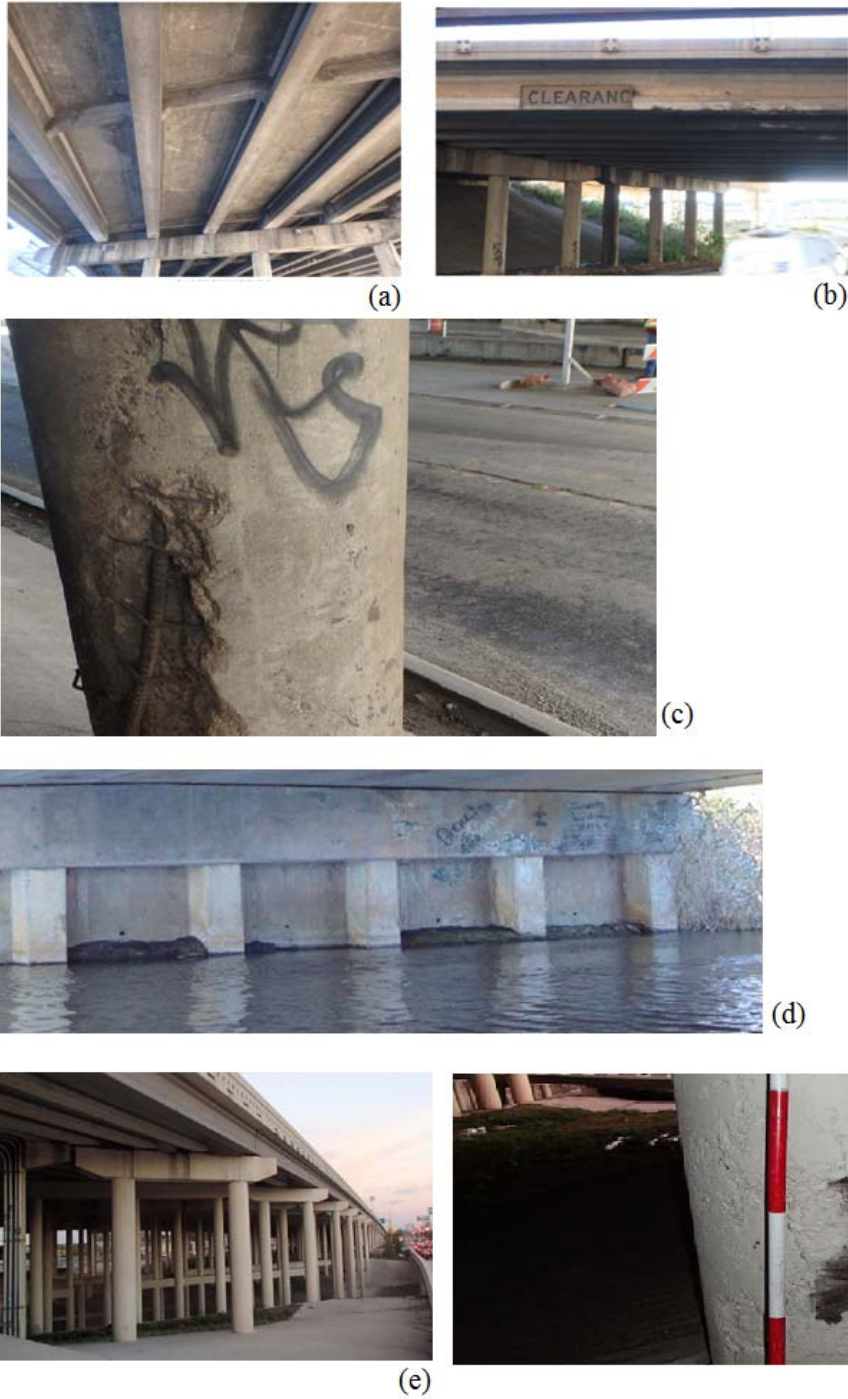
Bridge Located on IH 610 EB CONN & 18TH St. b. 1975, (a) Substructure View, (b) US 290 EB to IH EB Elevation View, (c) Concrete Spalling in Pile; Bridge Located in Brazoria County b. 2003, (d) Substructure Close View; Bridge Located on White Oak BYU Yale-Heights, (e) Substructure, (f) Concrete Spalling on Pile.
